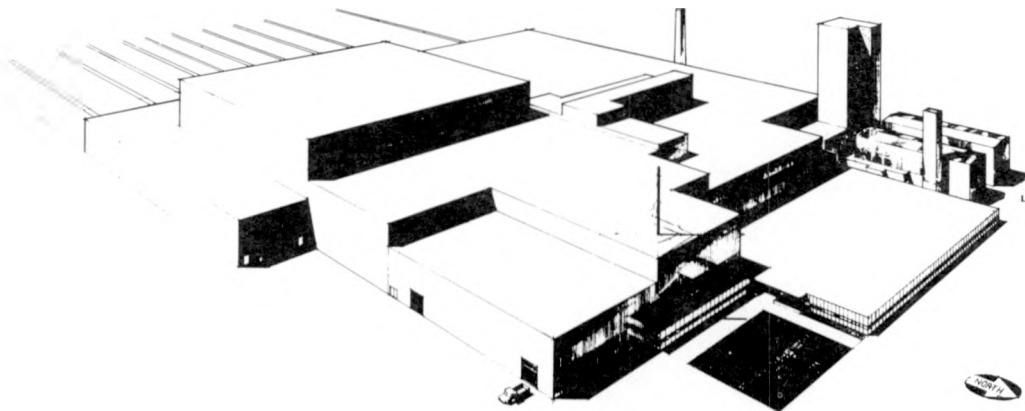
WASTE HANDLING BUILDING PERSPECTIVE
